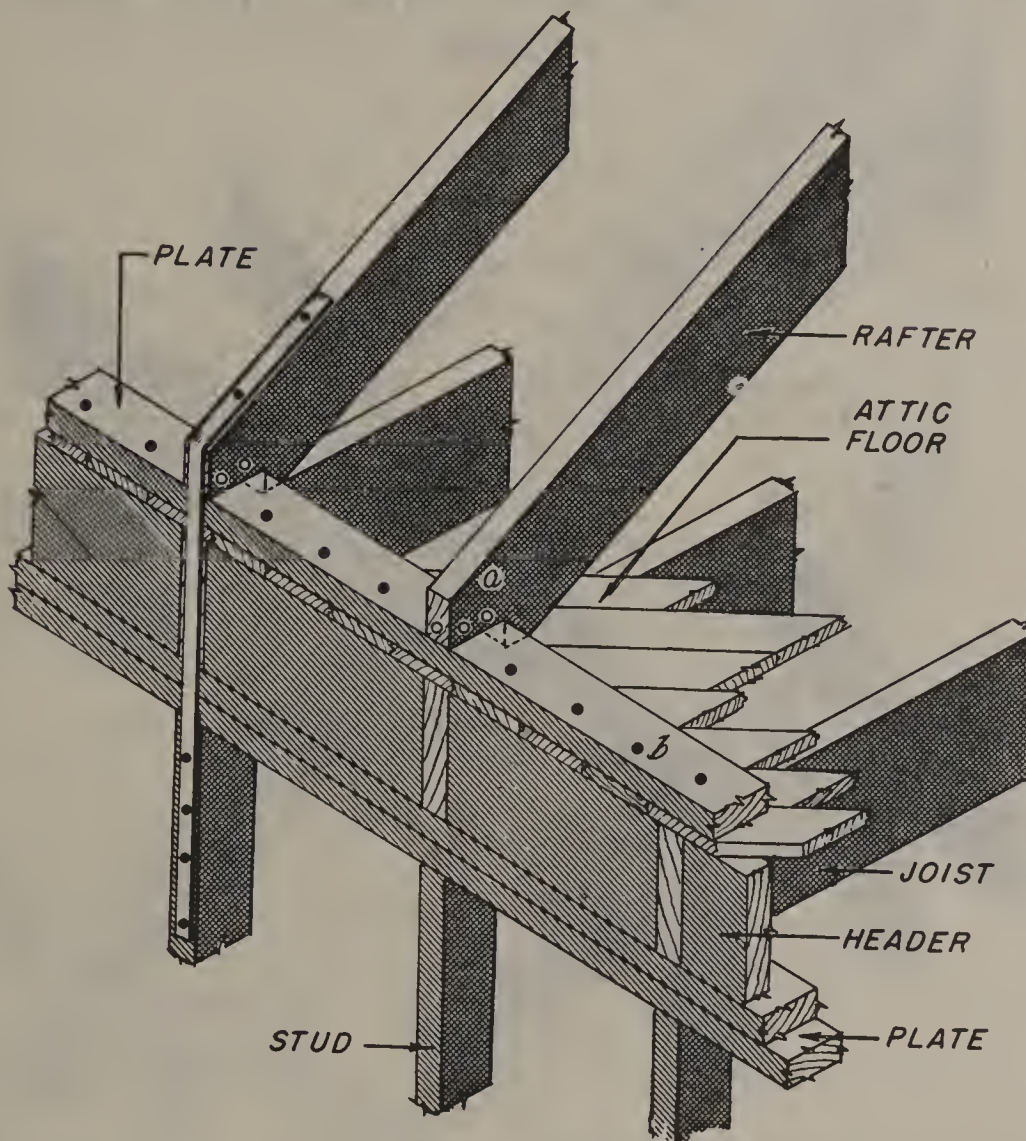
Beveled rafters backnotched over plate. *a*, Rafter toe-nailed to upper face of plate with two tenpenny nails on each side and with one tenpenny nail through vertical cut of rafter. *b*, Plate nailed through attic floor into each joist with one sixteenpenny nail and into headers or header joists with sixteenpenny nails spaced 4 inches on center. Note: Thrust of rafter is resisted by the bearing against inner face of the plate. The nailing specified is not actually sufficient to resist the uplift but by adding a strap to each rafter as shown at the left it would afford a resistance to the uplift of 400 pounds.
